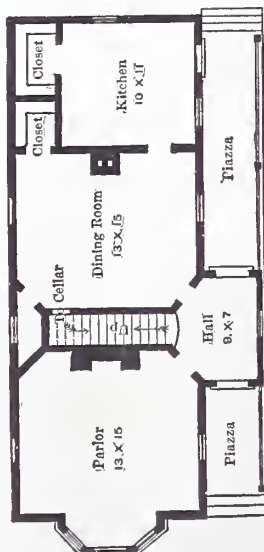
First Floor Plan.—Scale, 1-16 inch to the Foot.
